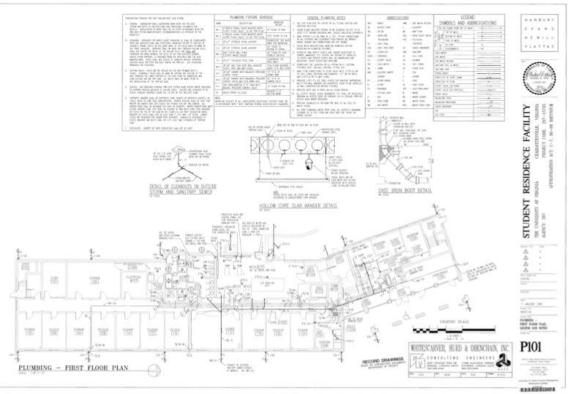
An example of one of the floor plans we were given from the Utilities & Facilities department for the Woody residence. These were used to determine how many aerators would be necessary to retrofit just one building. (Source: *Plumbing - First Floor Plan, Legend, and Notes (The University of Virginia).* Whitescarver, Hurd & Obenchain, Inc., 1999. PDF.)
